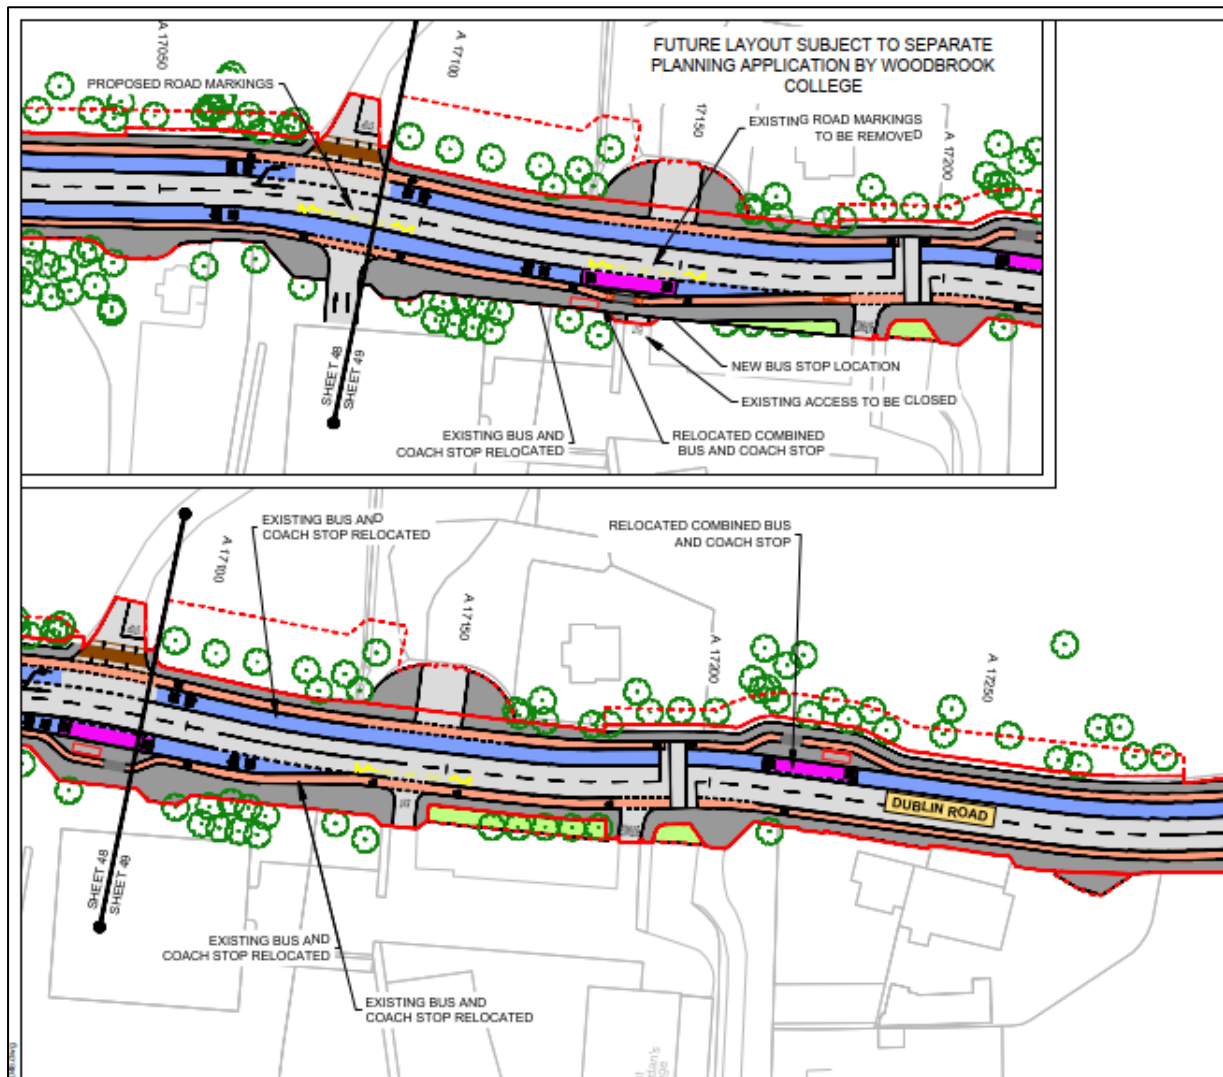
Extract from General Arrangement Drawing at Woodbrook College (Sheet 49)
